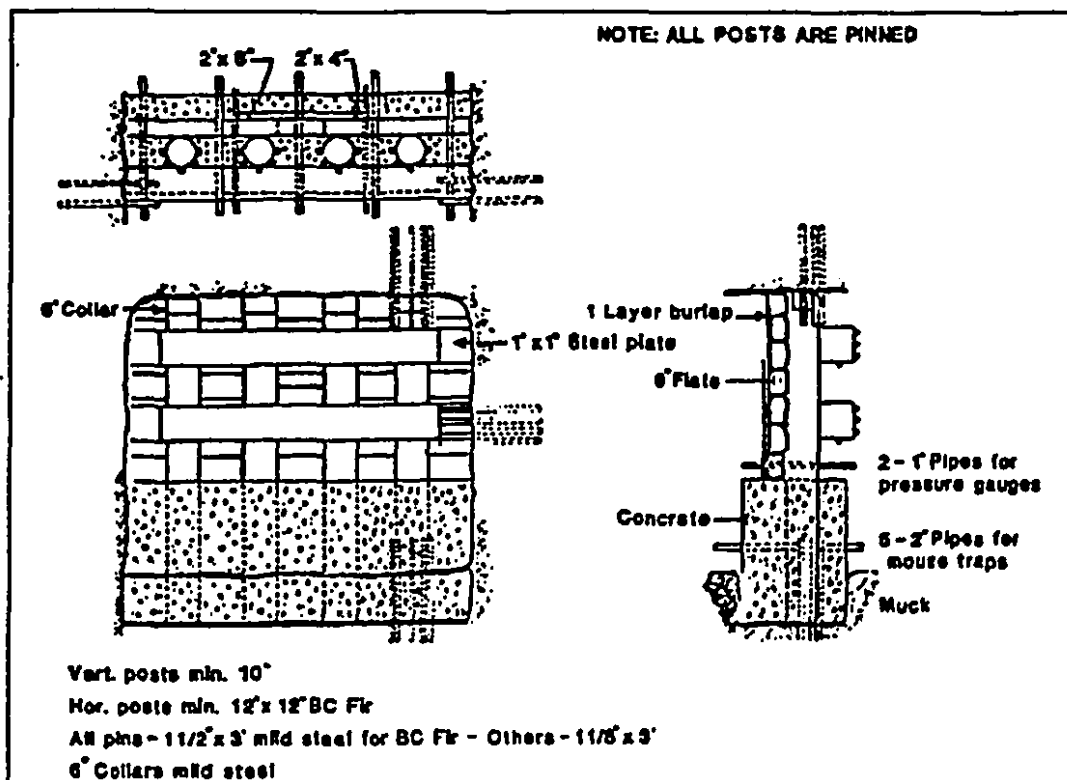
Bulkhead steel bearing plates in Dome mines
